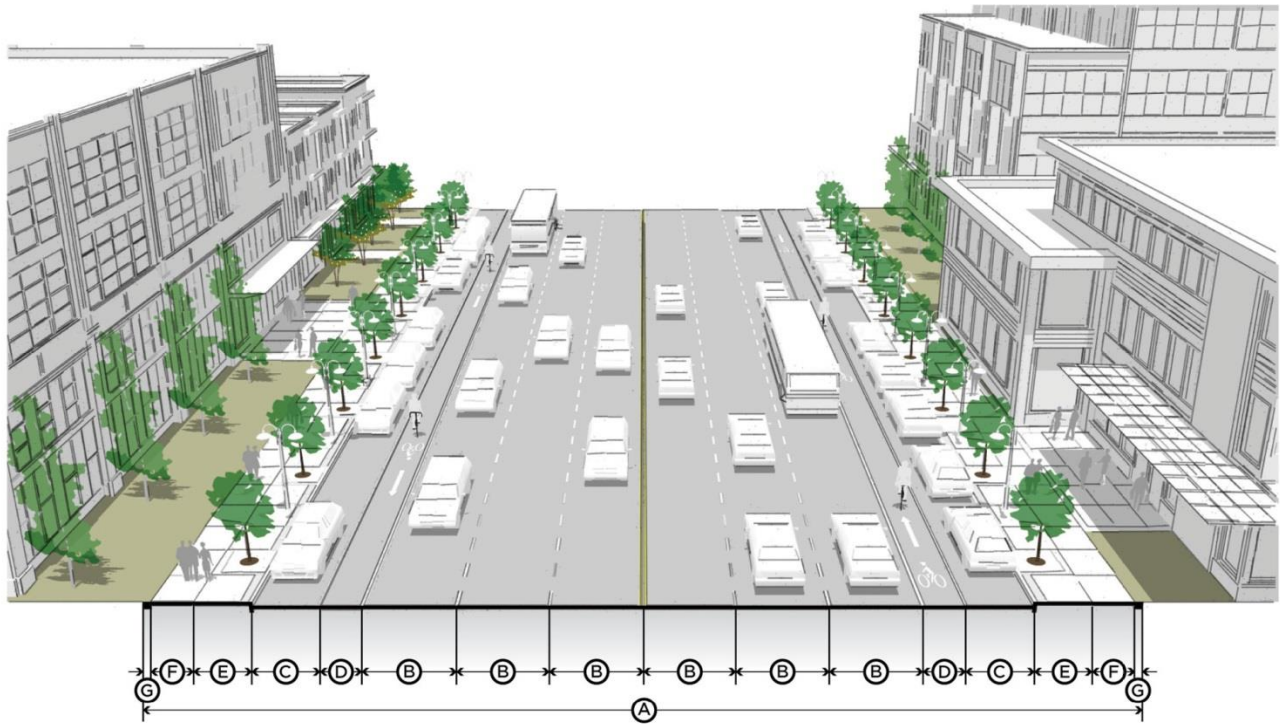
MAJOR STREET: FOUR-LANE DIVIDED
